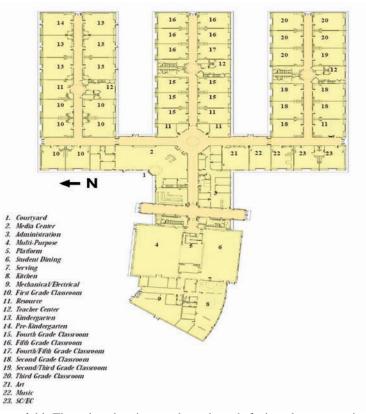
Floorplan showing north- and south-facing classroom wings.
